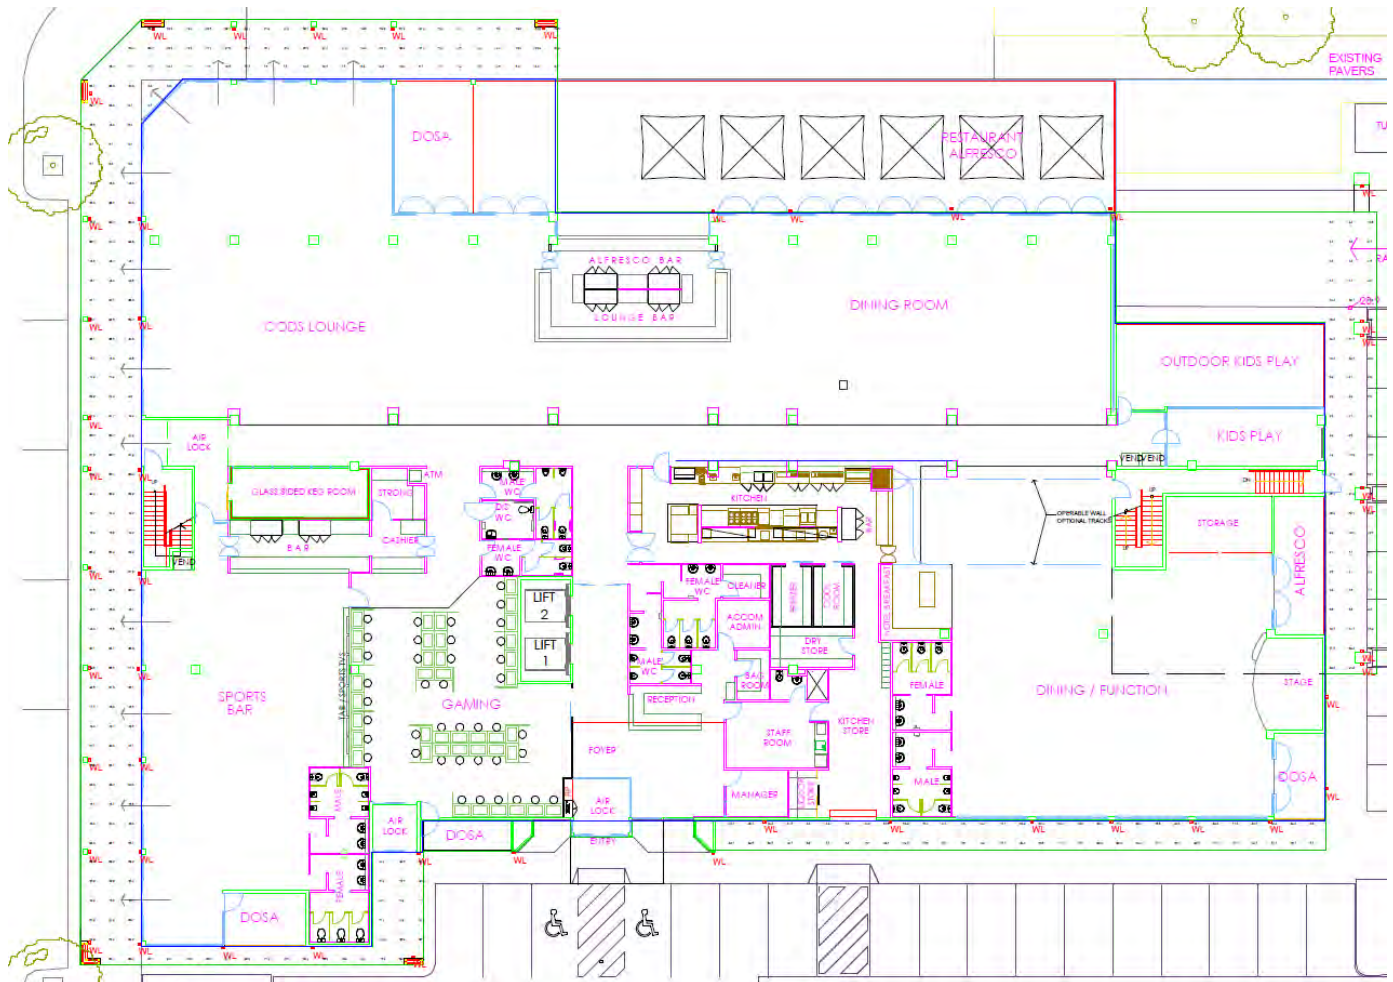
Proposed Northern and Western External Building Area lighting layout (Facing Road)
